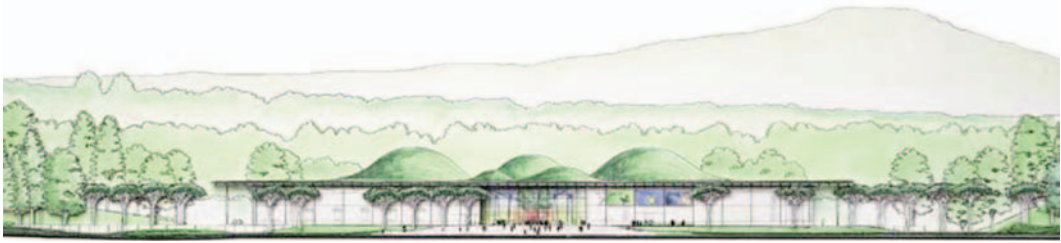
An artist's sketch of the new Academy building as seen from the the front. Image provided by Renzo Piano Building Workshop.
